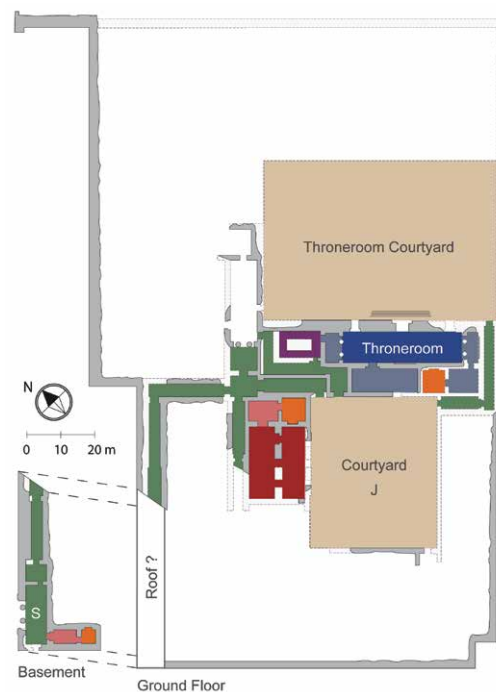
(right) Floor plan of the North Palace at Nineveh. Based on Kertai 2015a, pl. 19.
